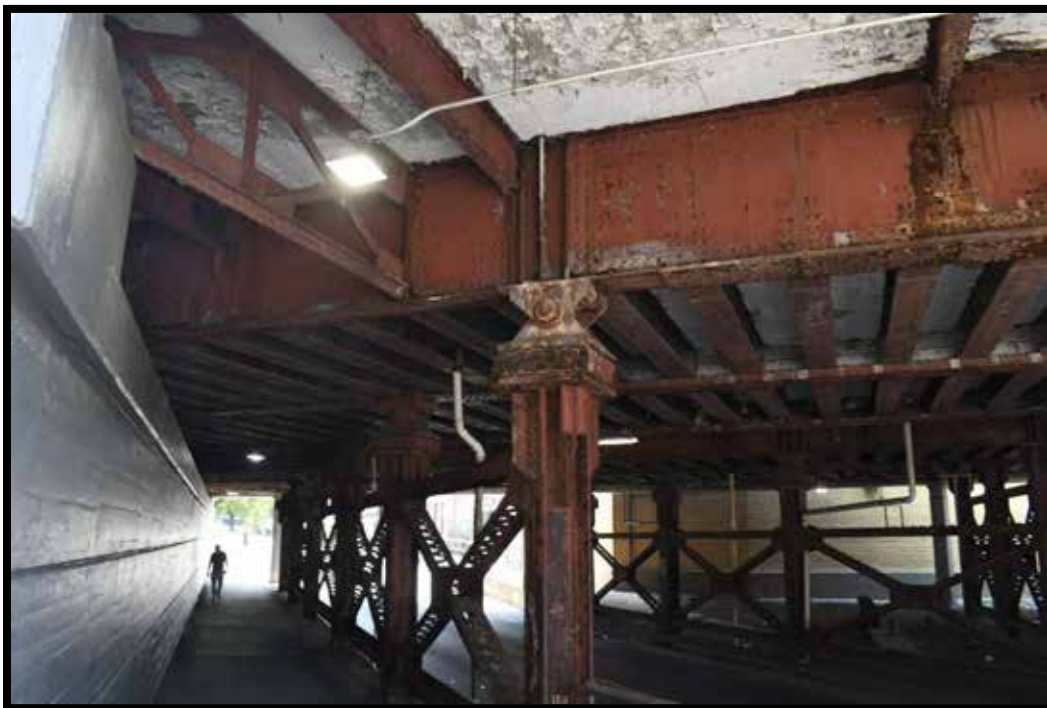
CSX Railroad Bridge No. 059R00620N. Representative examples of steel trusses, girders, and decking, looking south. Note the steel hinges used to connect the girders to the trusses.
